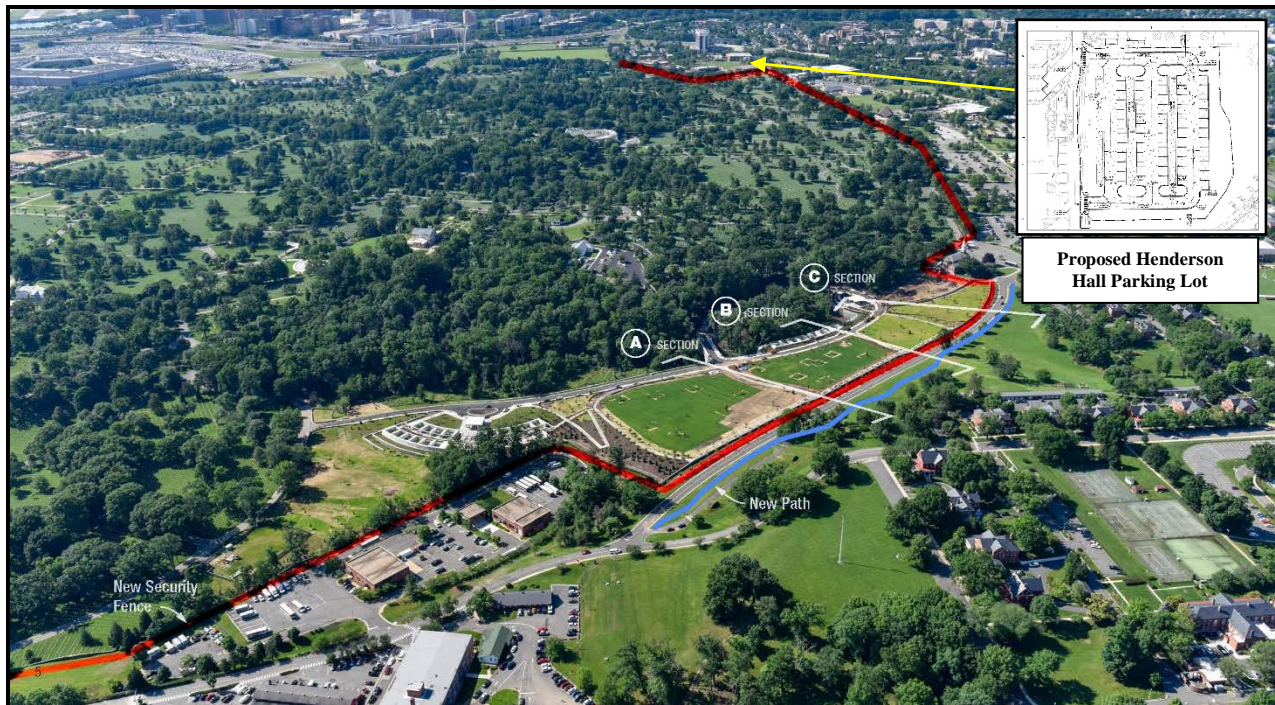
Proposed Fence Alignment and Henderson Hall Parking Lot
